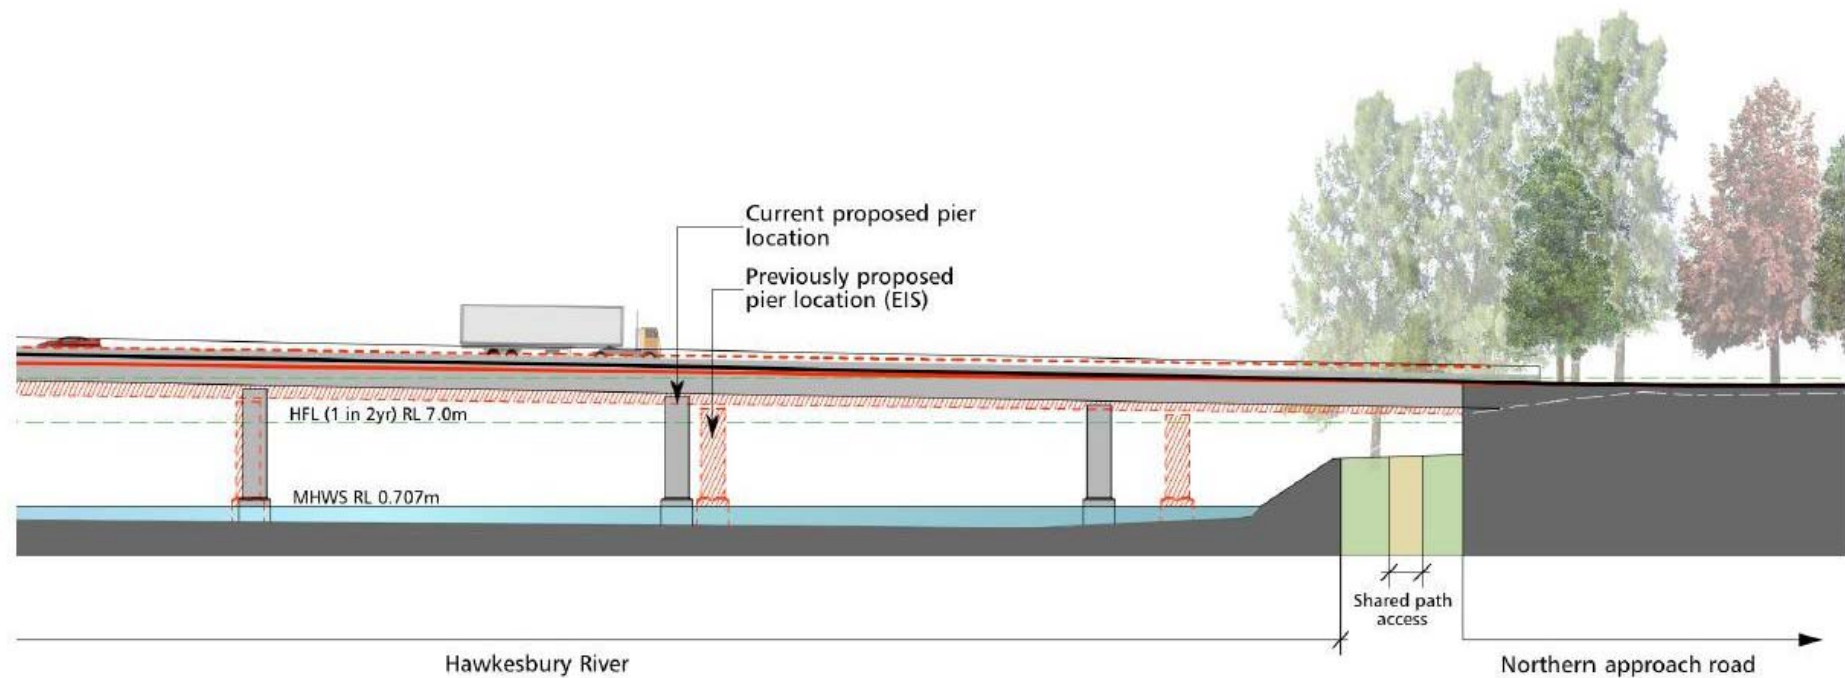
Longitudinal section of the replacement bridge showing the elements that have been redesigned. The level of the replacement bridge and barriers is minor on this side of the bridge. The amended locations of the proposed piers are shown in grey.
